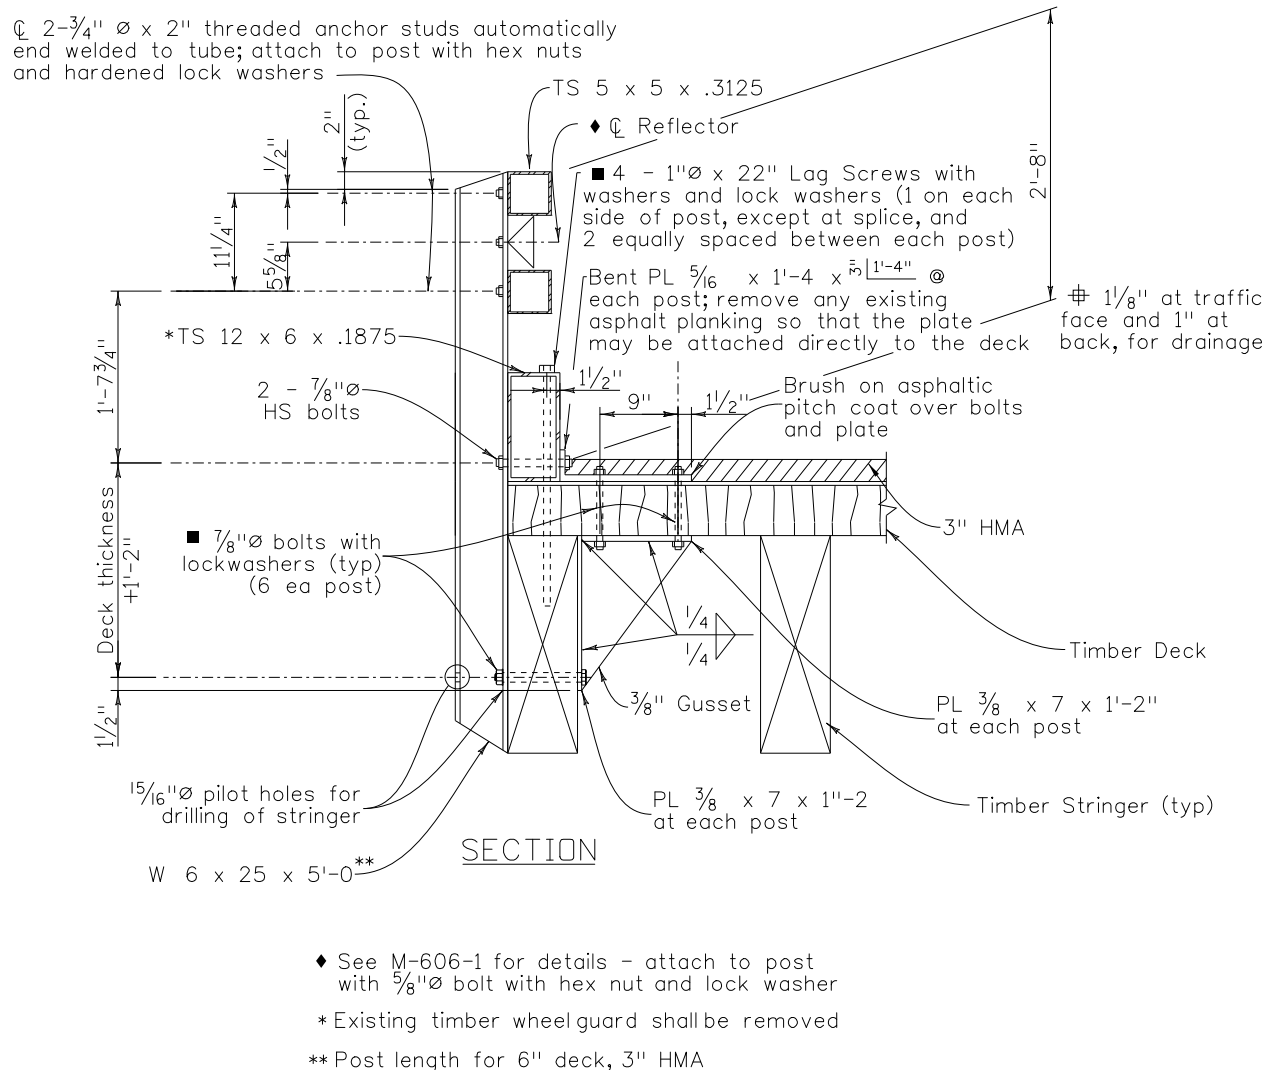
(A)-3 Sample Section showing paving detail and Post Connection
